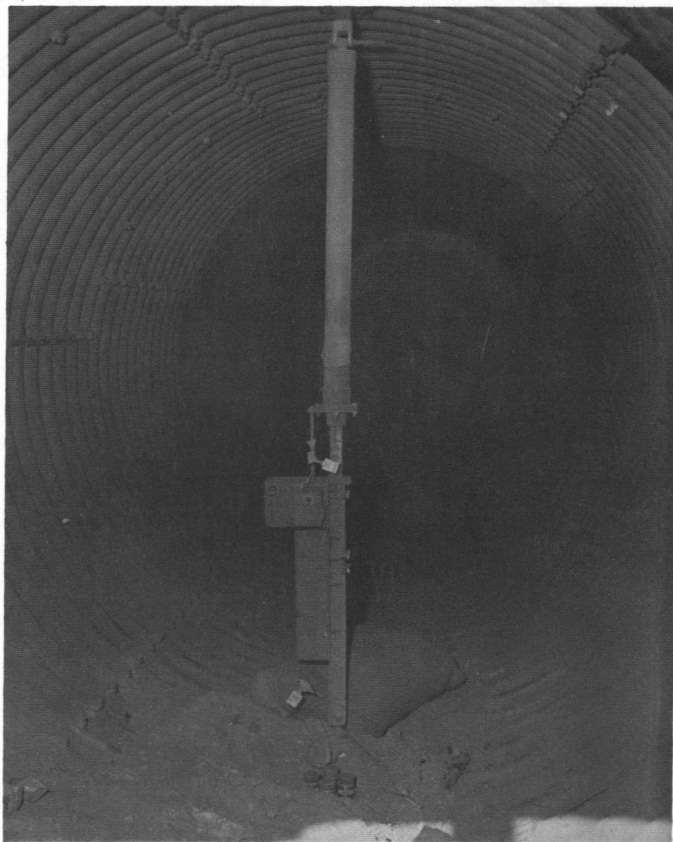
General interior view facing north, showing instrumentation, dummies, and debris after Charlie shot.
